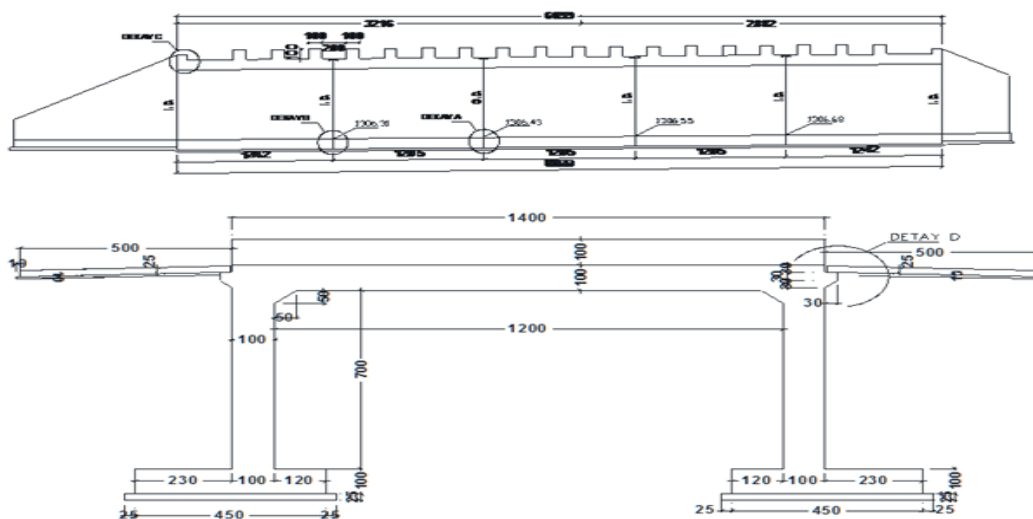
4. The width and length sections of Reinforced Concrete Bridge
